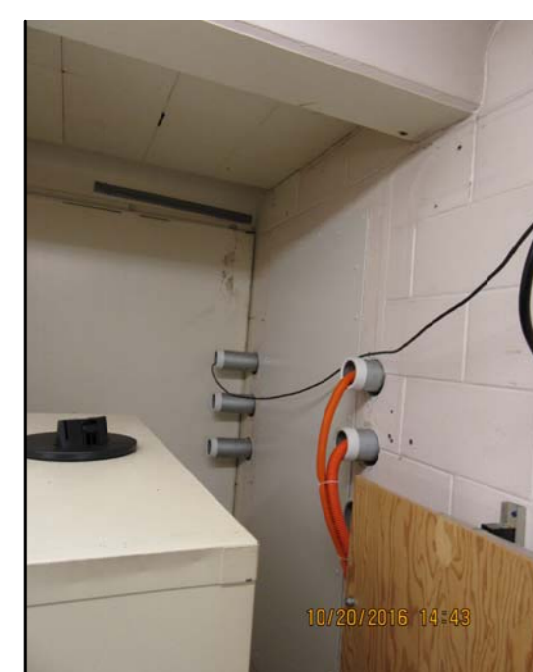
EXISTING EXTERIOR JUNCTION BOX & CONDUITS
